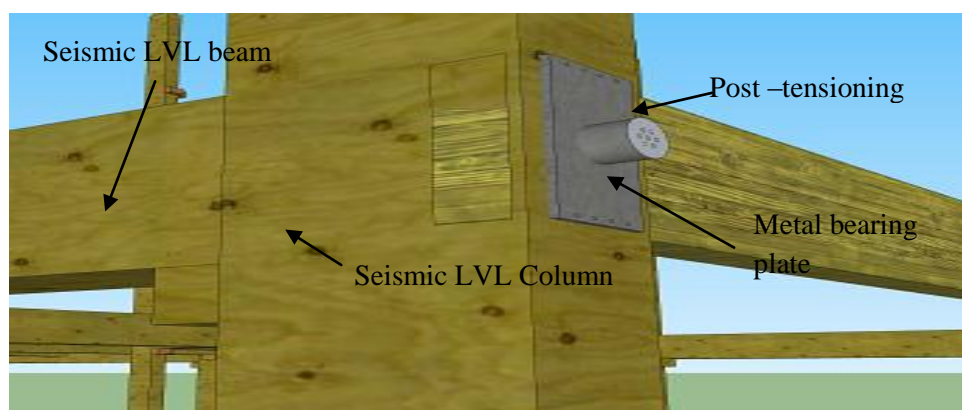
External Post-tensioned anchorage details in the moment resisting frame.
